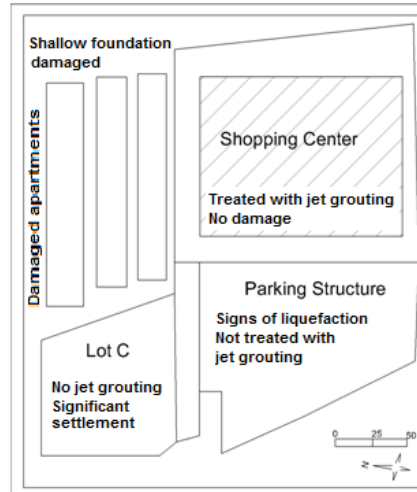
Site plan of shopping center area showing improved area and unimproved areas (Martin et al. (2004))
